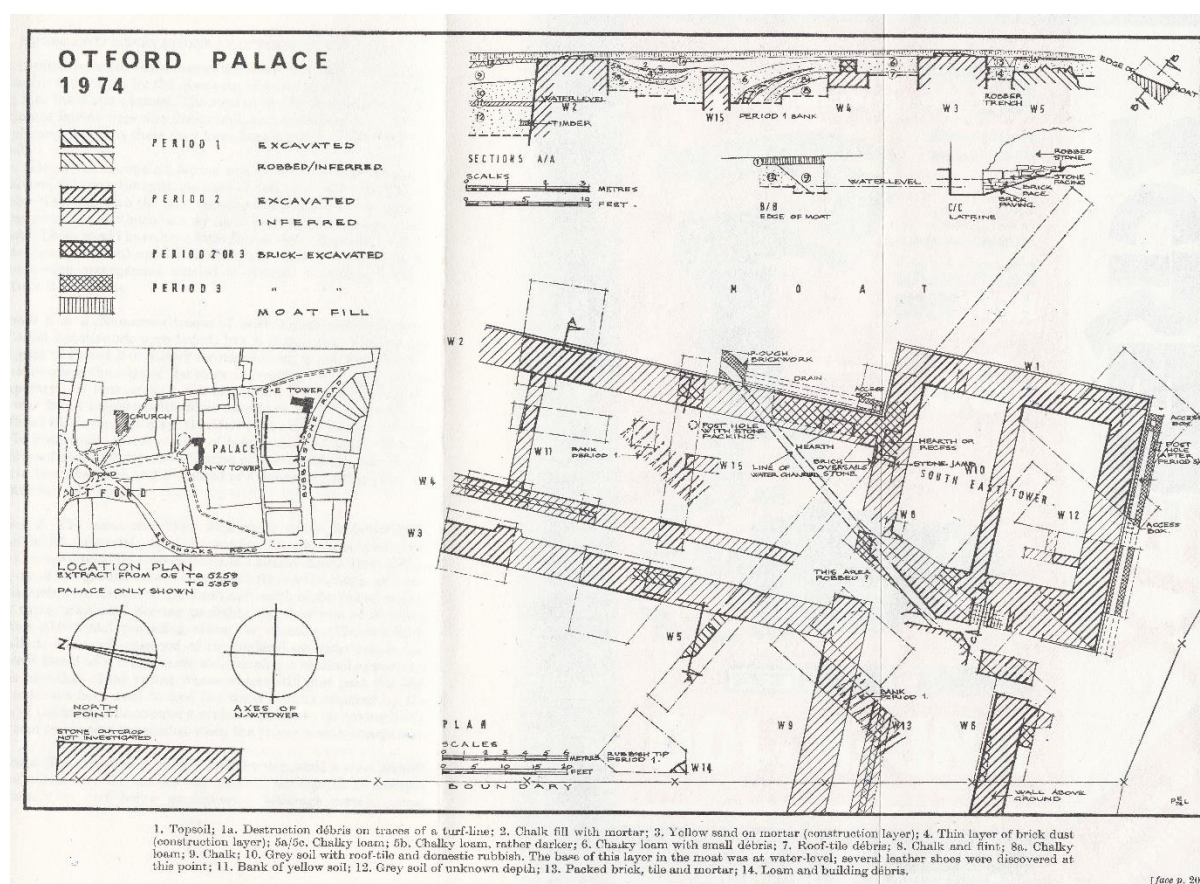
Plan of the south-east Tower. (From Philp, 1984)
